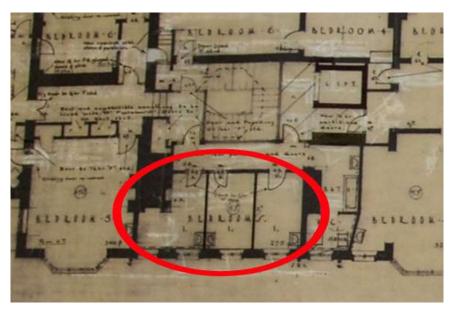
1953 Plan of rooms F24 and F25 (created from one room).
